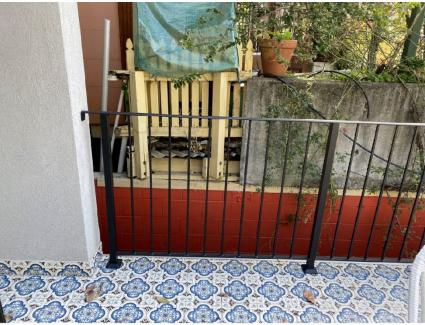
This figure shows the interface between 23 and 25 Darling Street – showing a current lack of privacy and poor interface
